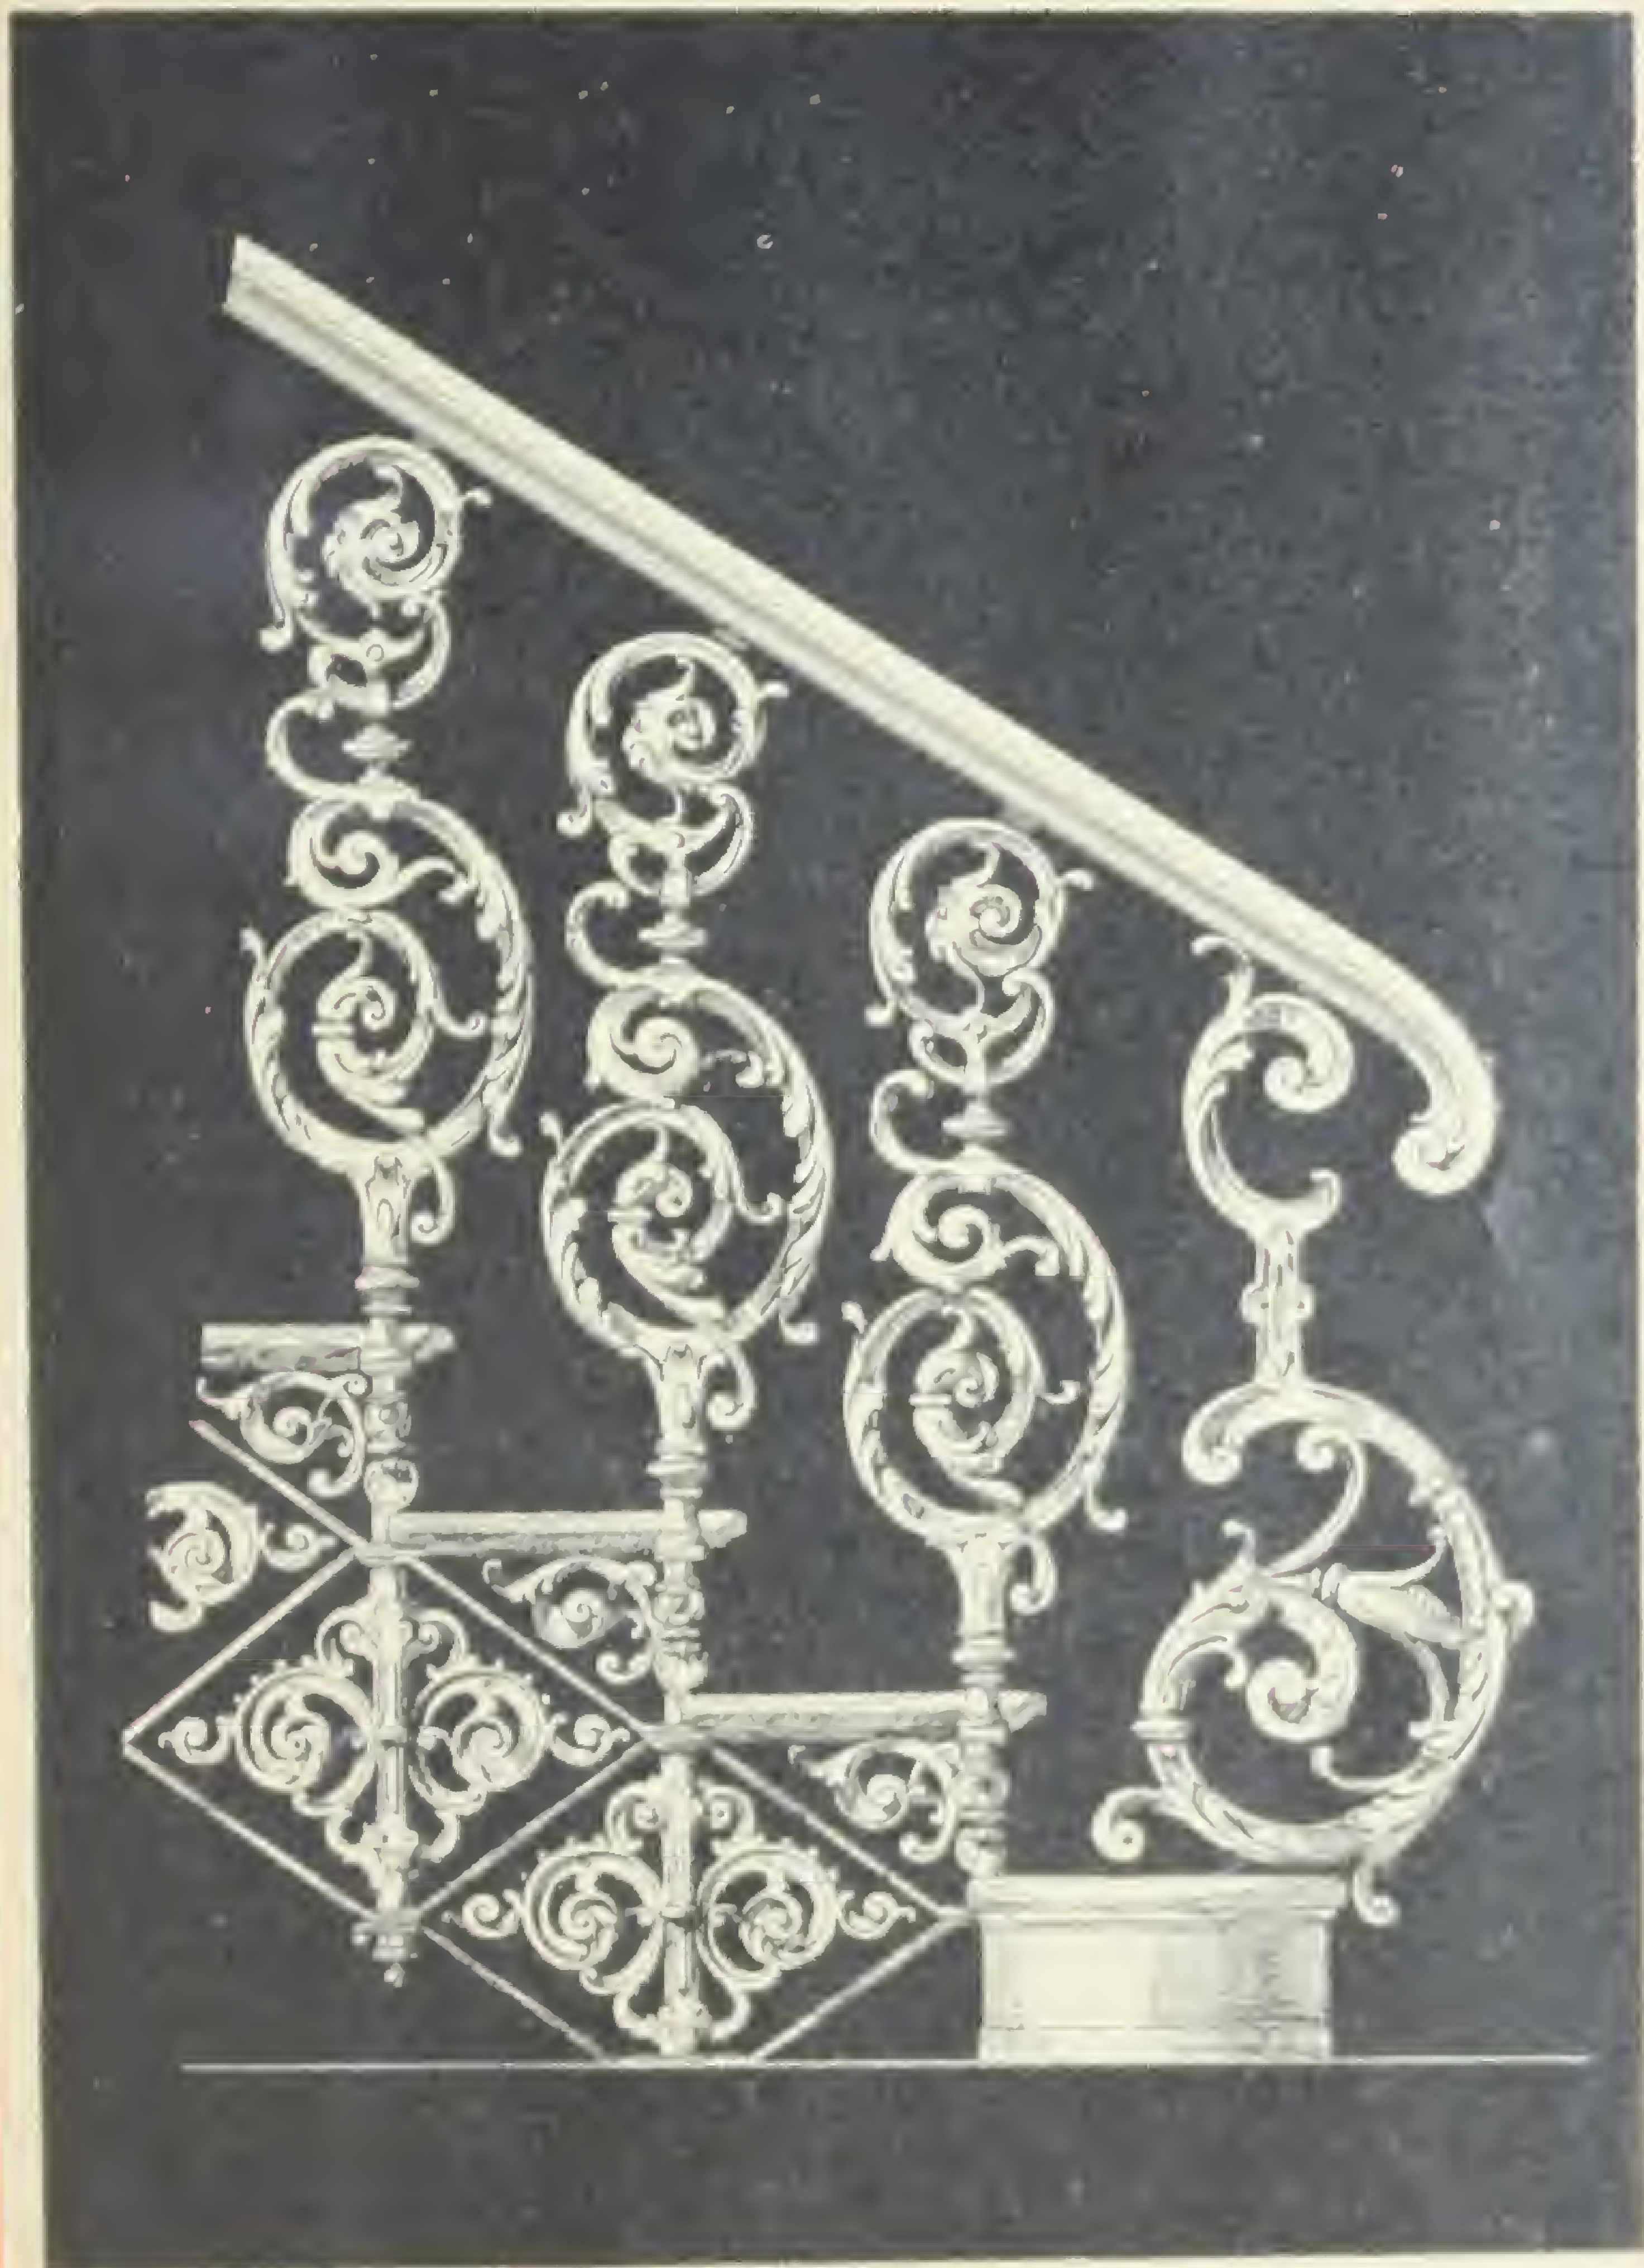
Joly's patent fireproof stairs (Renaissance).
